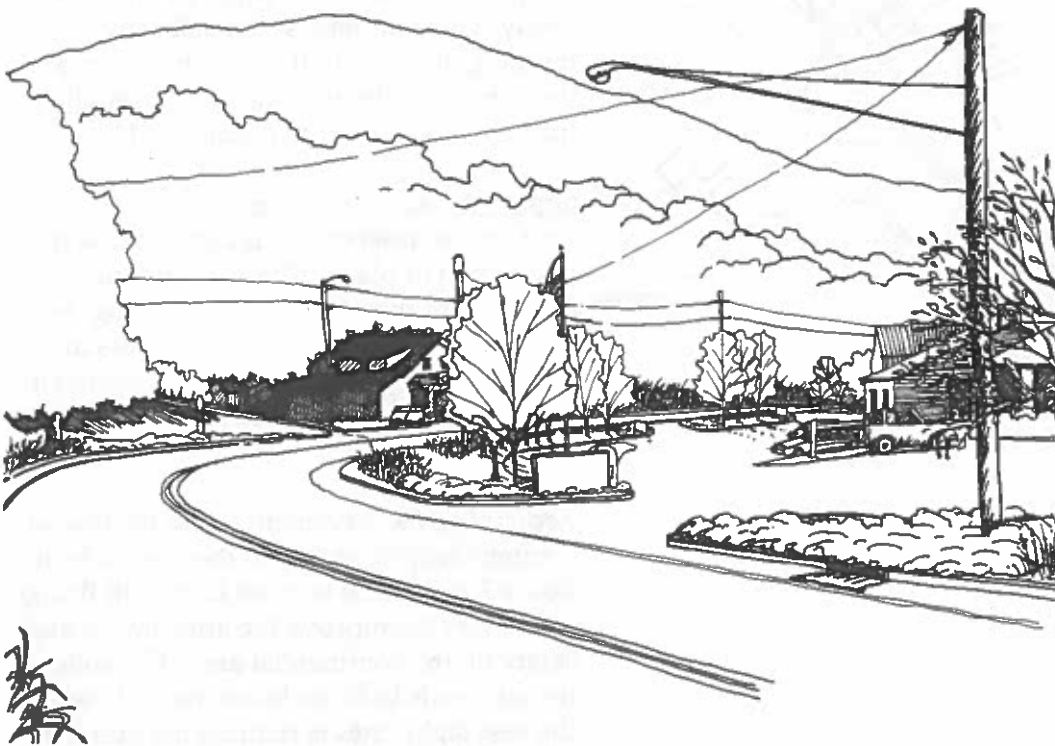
Proposed character of plantings at Cornwall Bridge
